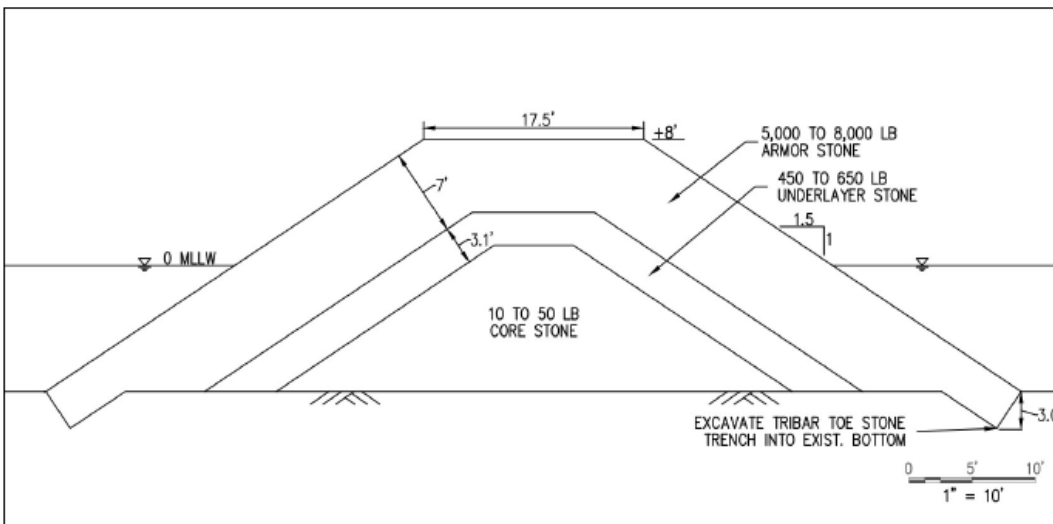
Typical Cross-section of Replace Existing Northwest Breakwater (Sta 0+00 to 11+00) (Sea Engineering, 2015)
